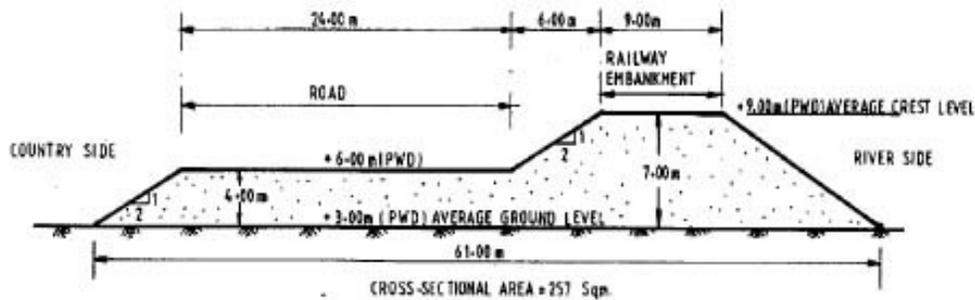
Cross-section of the multipurpose embankment along the Balu River.
